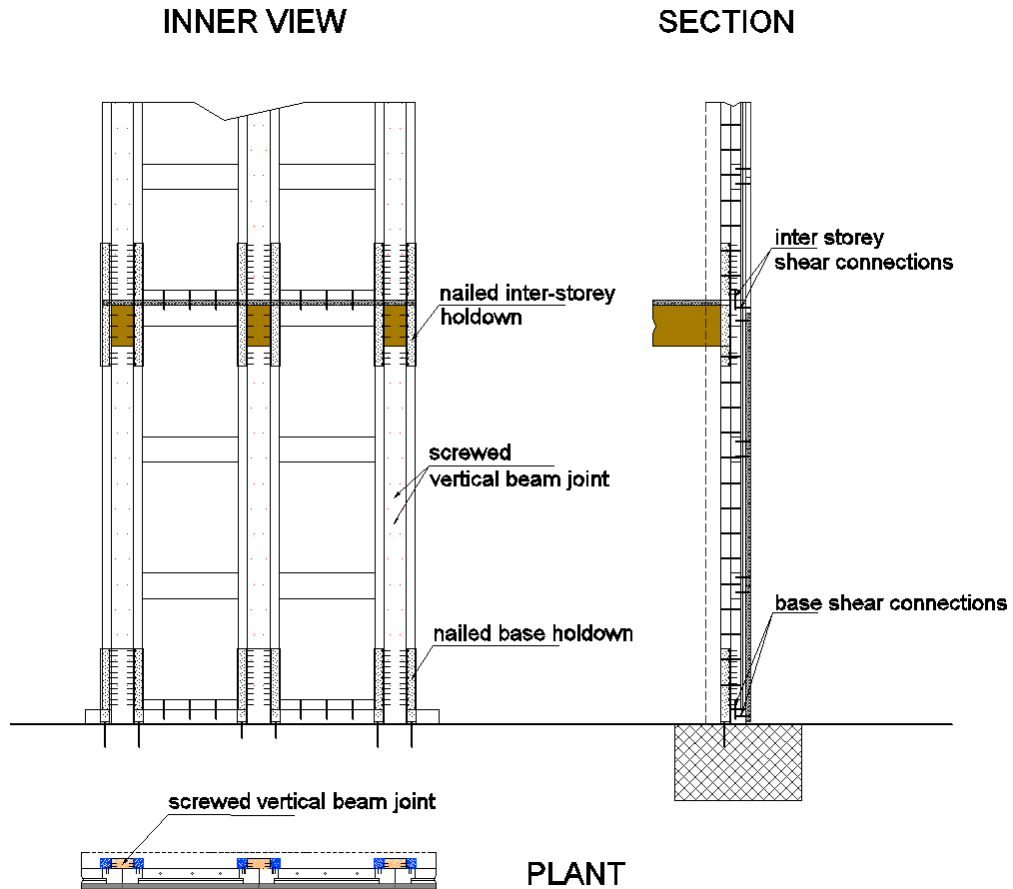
View of a two storeys composite wall with indication of the connection elements
